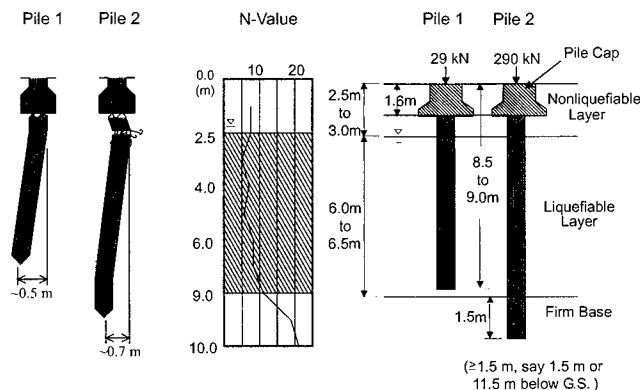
Damage to pile foundations due to lateral spreading under NFCH building, 1964 Niigata earthquake, Japan (Hamada, 1992, 2001)
